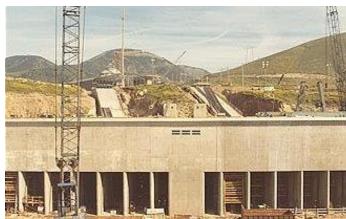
Undated photo of Intake Structure under construction, looking northeast. The openings are the intake gates that are now submerged. The six vents in the center is visible above the waterline. Source: PG&E.
